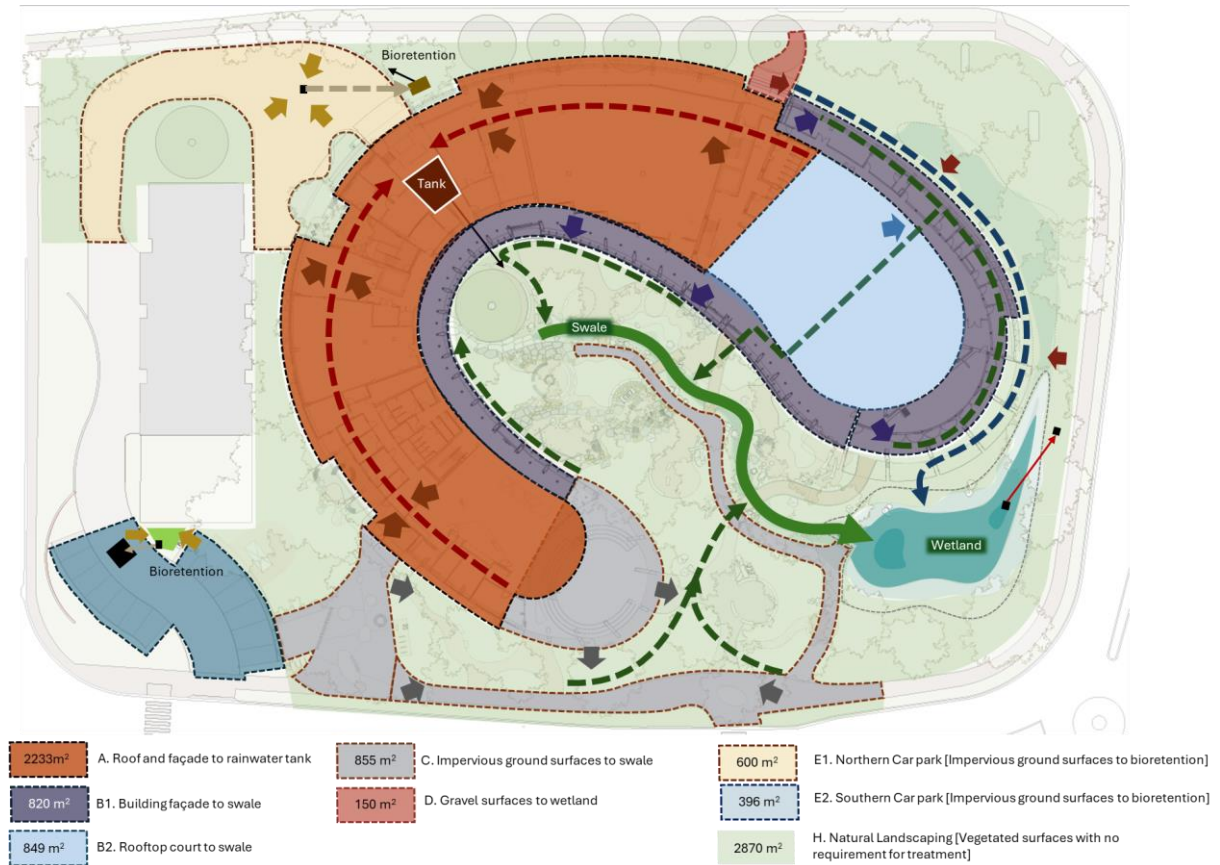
Schematic plan of the proposed WSUD elements (not to scale). Arrows show indicative stormwater flow paths and drainage connections.
